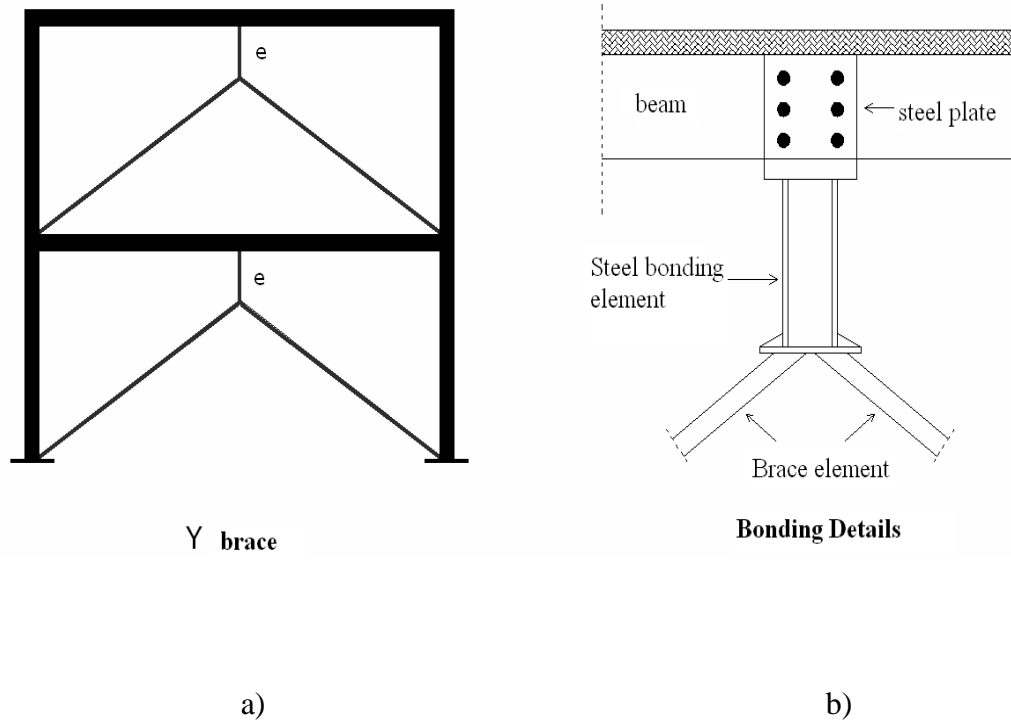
a) RC frame retrofitted with inverted Y-steel bracing and
